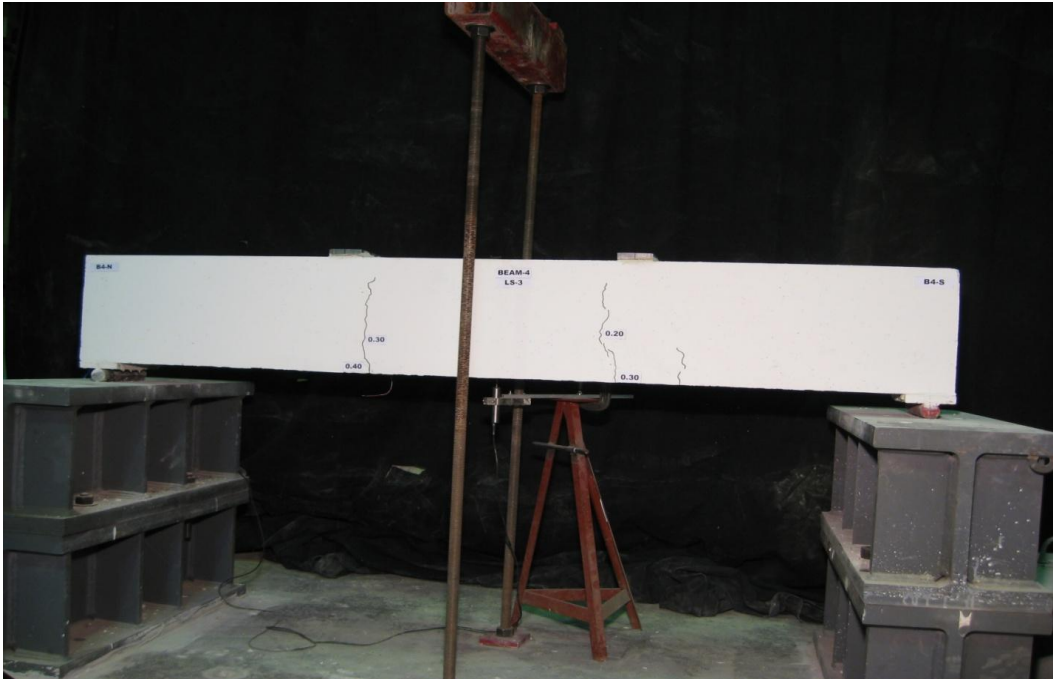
Cracking pattern for beam 4 at a load of 35.19 kN (B4-LS3)
